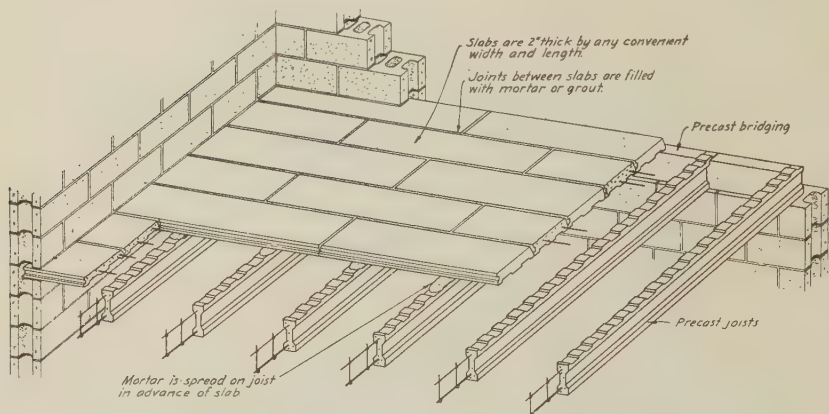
PRINCIPAL CONSTRUCTION DETAILS OF PRECAST
